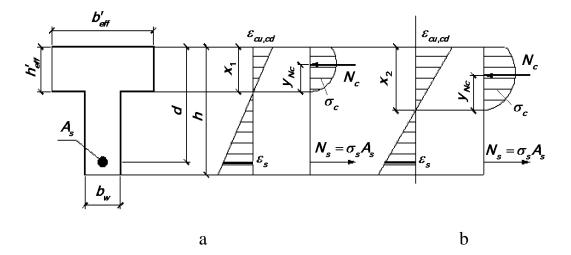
Design model of the normal section: a - normal section of the element; b - stress and strain diagram
